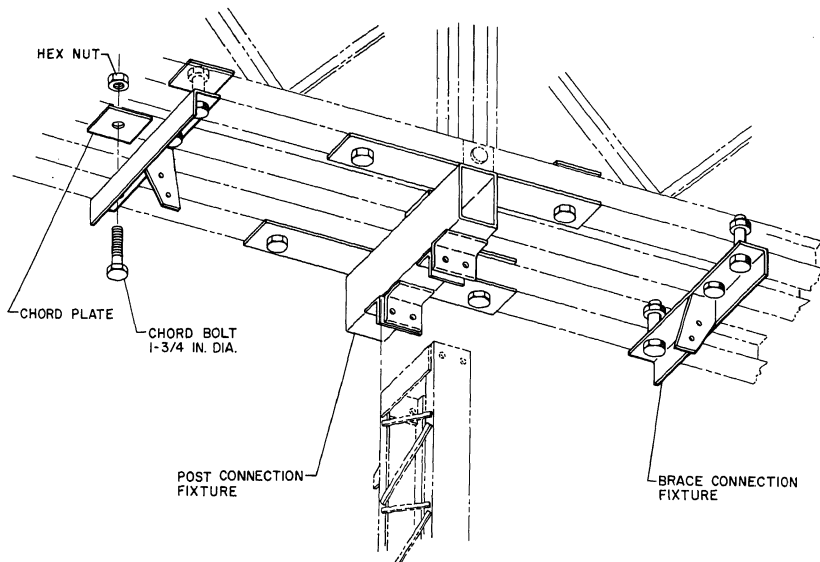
Brace connection fixtures bolted to panel lower chord.
